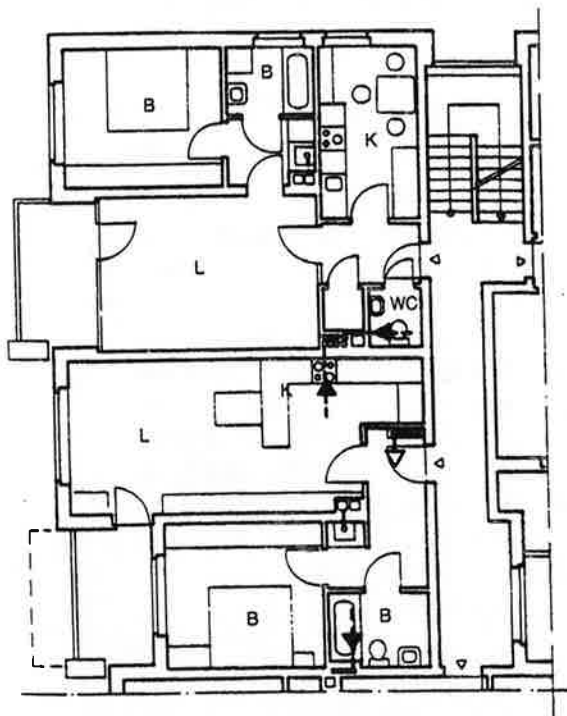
Layout of the test dwelling and the neighbouring corner dwelling showing the arrangement of shafts.
